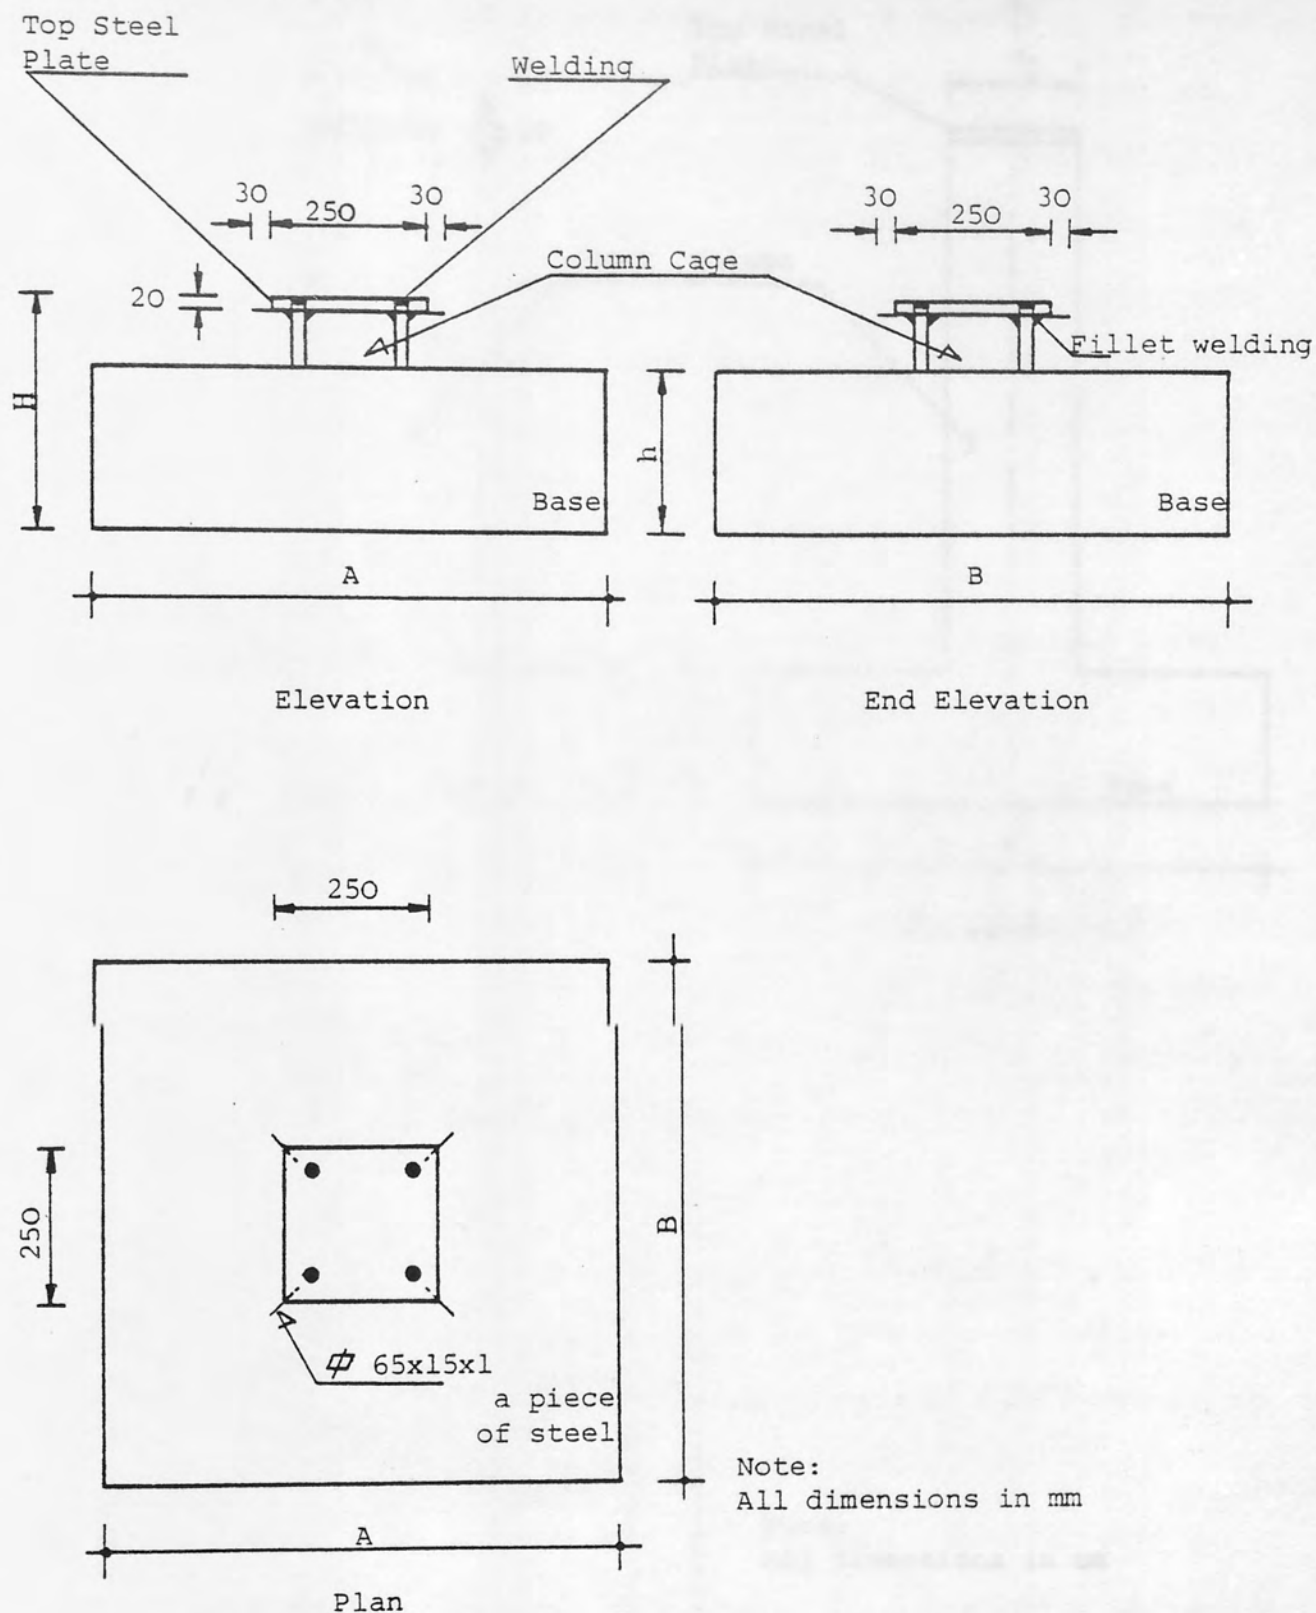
GENERAL VIEWS OF TEST SPECIMENS IN PART ONE AND FOR THOSE WITHOUT A SHORT COLUMN IN PART TWO RESPECTIVELY
